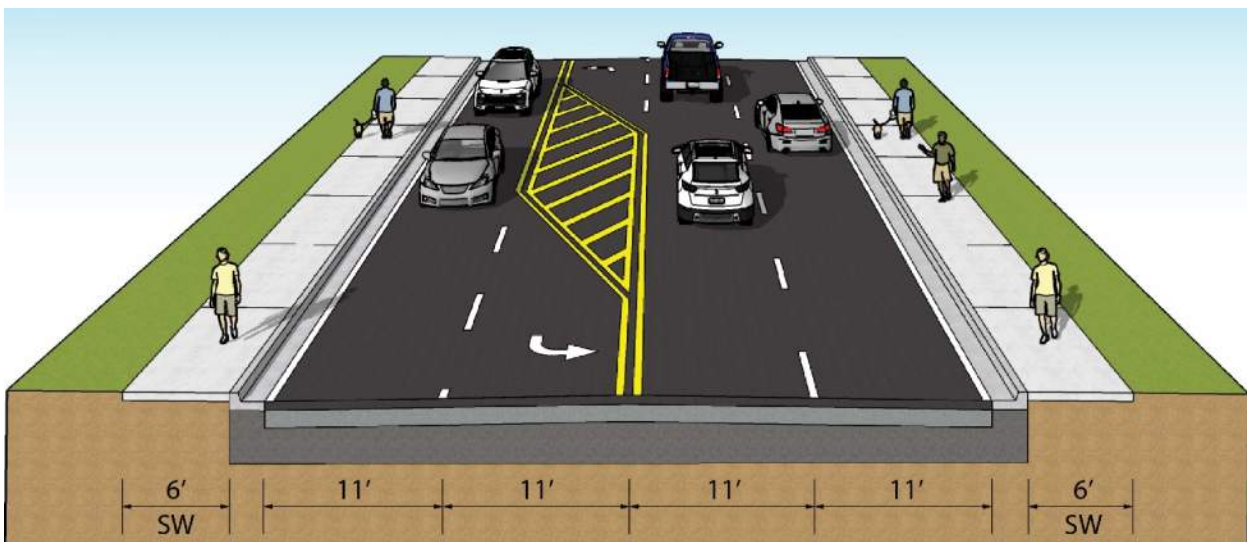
Proposed Typical Section from Chestnut Street to Pierce Street
